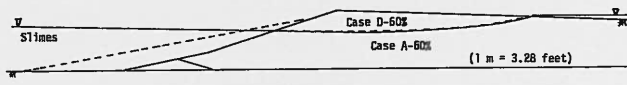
Effect of proposed cyclone tailing facing -- lower pool elevation at 10,911 feet.
